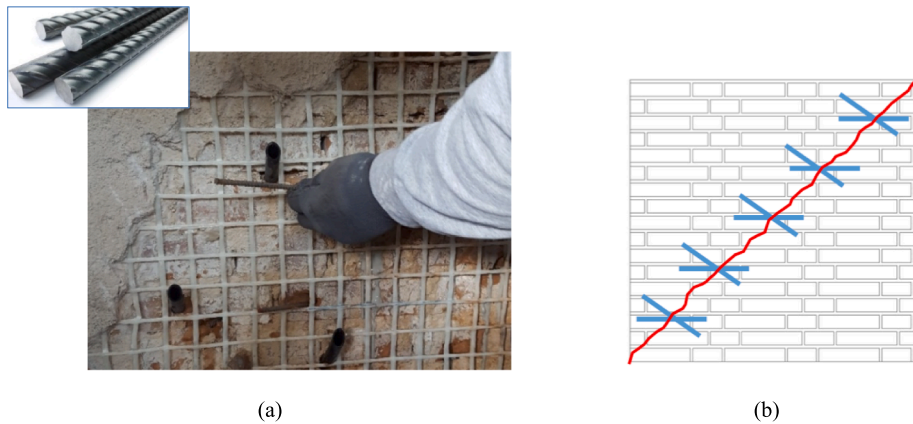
Repair of damaged walls with stainless steel anchors: (a) application of the stainless steel rebar into the grouted tubes, (b) Arrangement of the stainless steel ribbed rebar used to bridge the diagonal crack.
